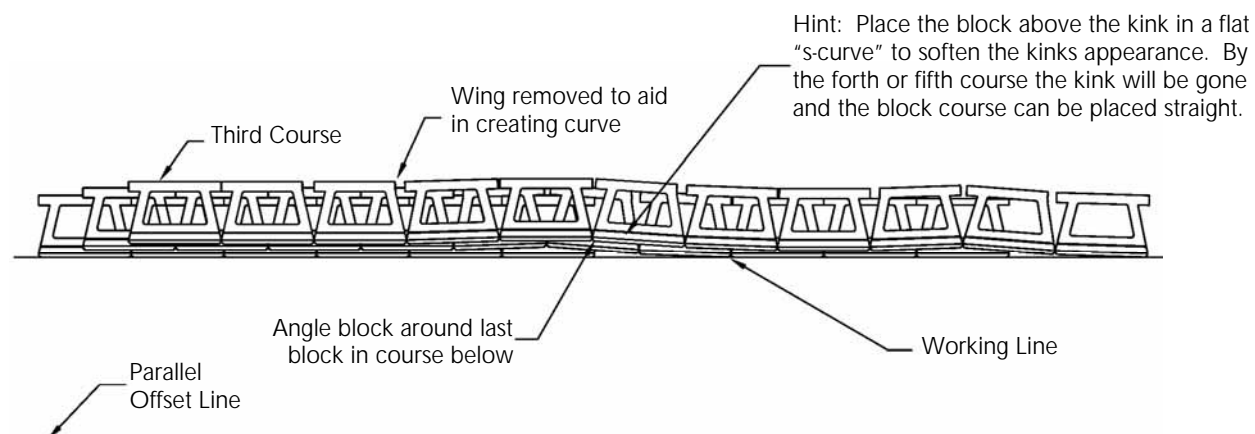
Using a Kink to Build a Straight Wall – Building the Third Course
